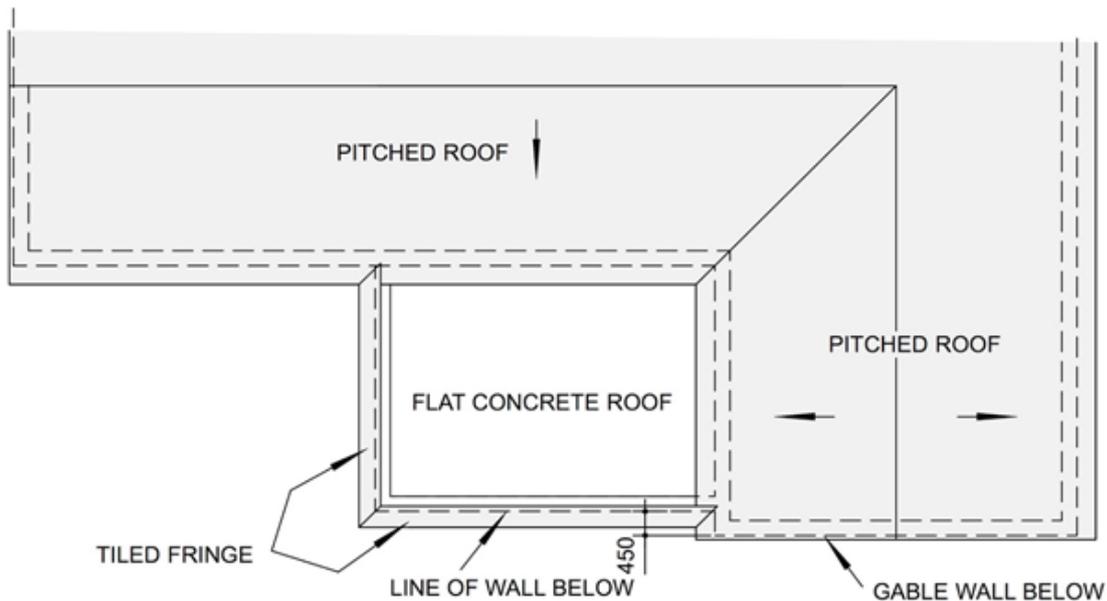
Typical flat roof with fringe set in the corner of an L shaped main pitched roof building.
